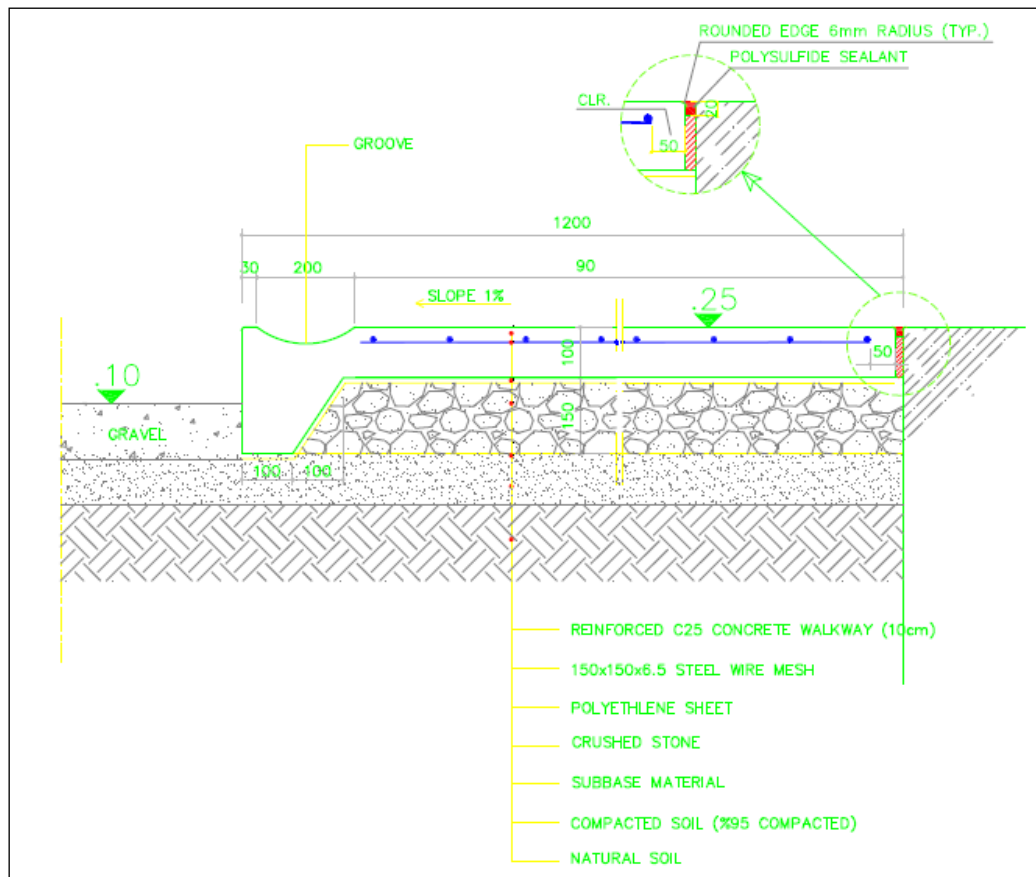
Sidewalk detail per the 100% design drawings (Courtesy of USACE)
